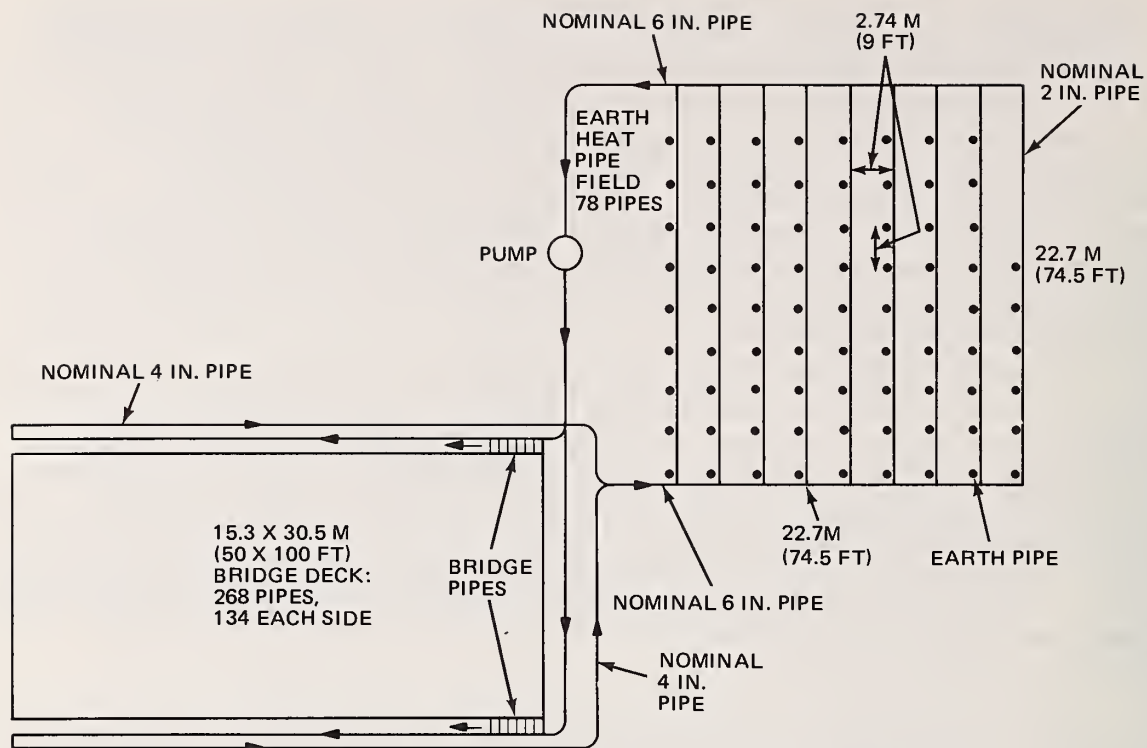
Schematic layout of earth heat pipe/pumped loop preferential bridge de-icing system
